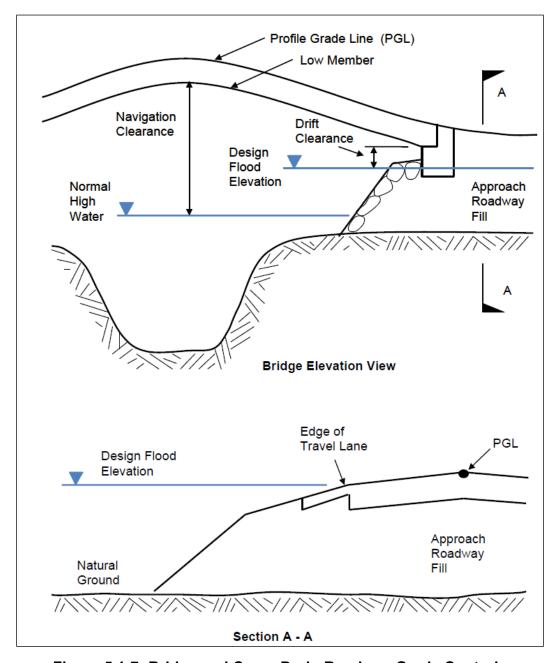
Bridge and Cross Drain Roadway Grade Controls
